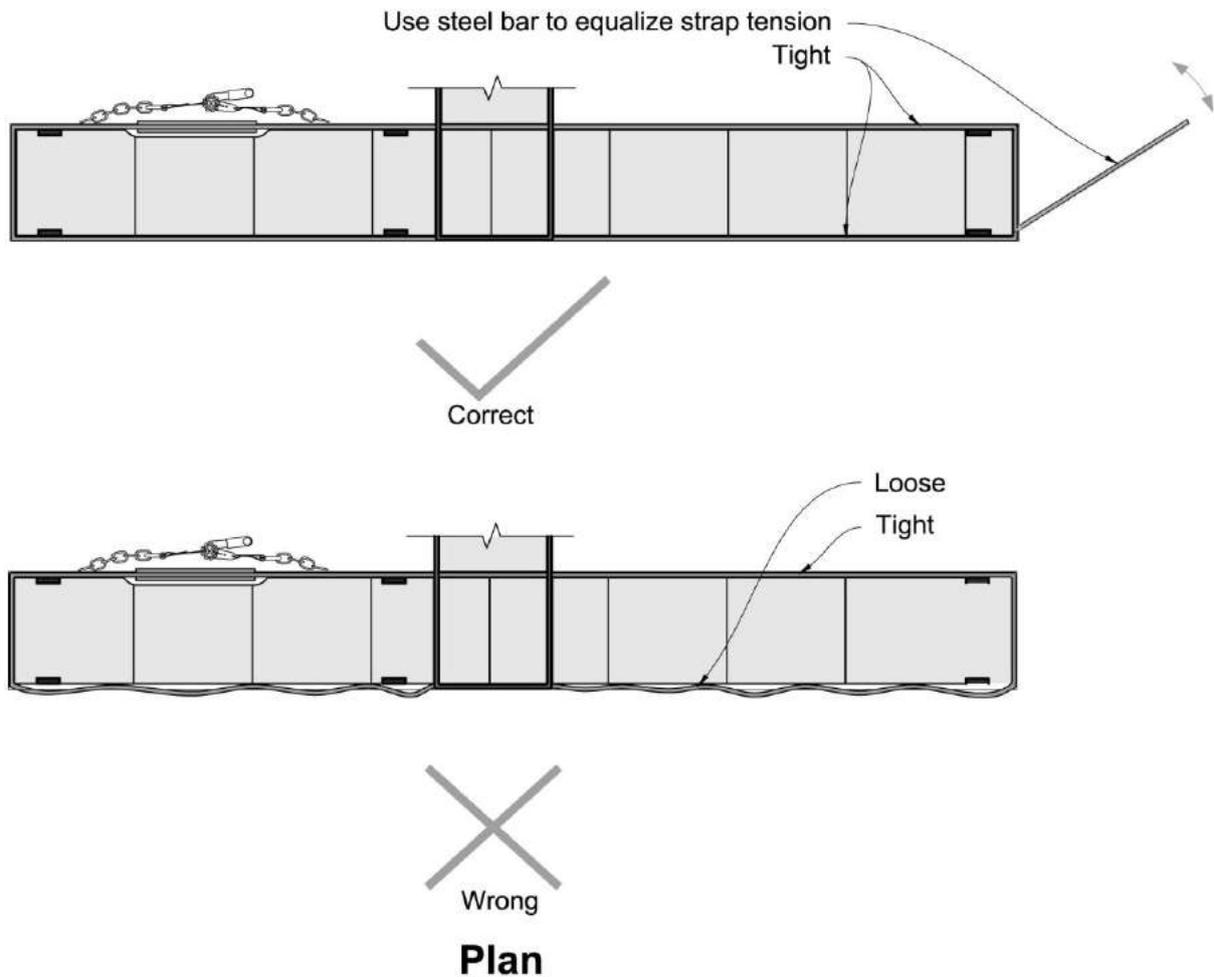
Levering the strap at the end of a wall is necessary to achieve equal tension on each side of the wall.
